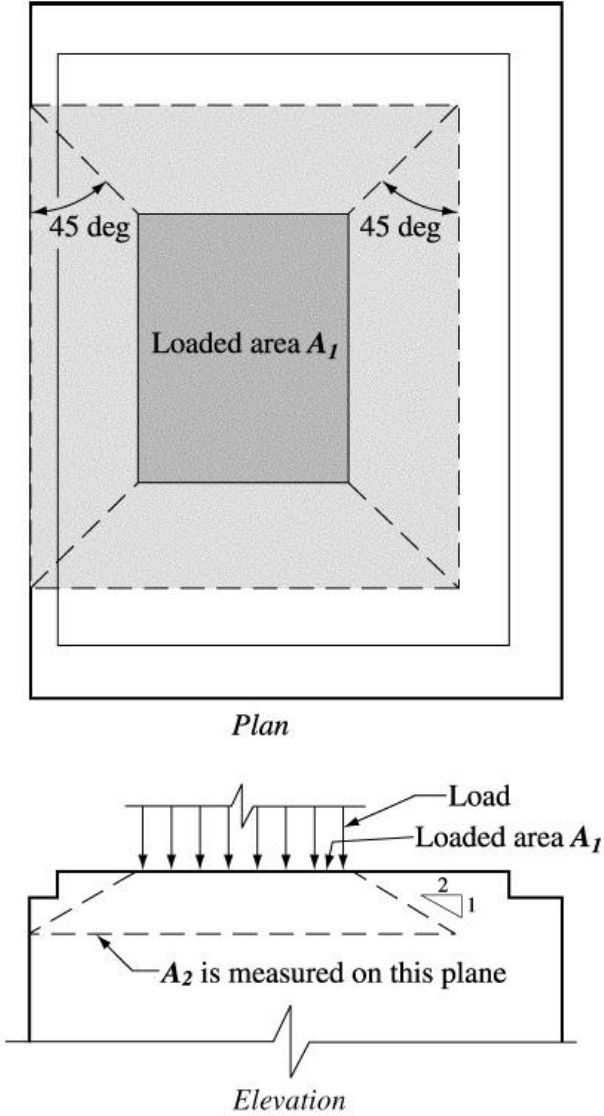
Concrete Bearing Area at Column and Footing Interface
